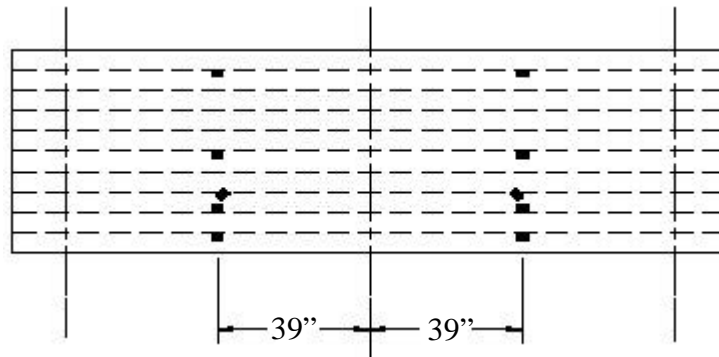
Internal strain gauges between the bottom plate and tube panel
